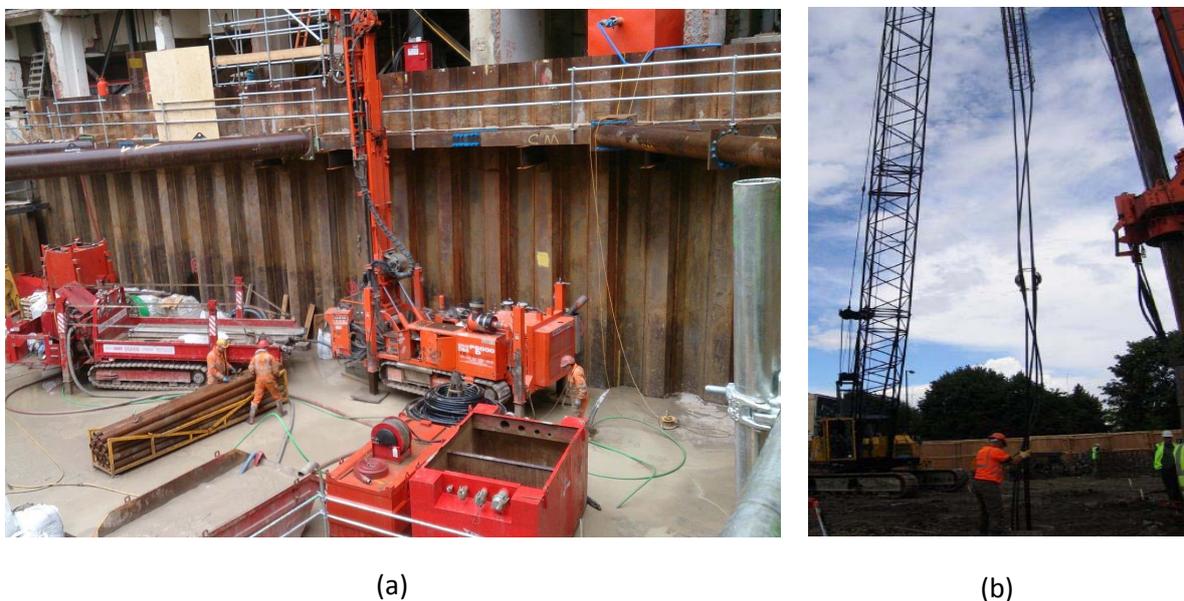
(a) Constructing 25 200 m deep boreholes in basement in Central London, added 8 weeks to construction schedule, (b) Installation of Geothermal Loops into 260 25 m deep 900 mm Rotary Bored Piles at Westminster Academy, incurred no impact on construction schedule.
